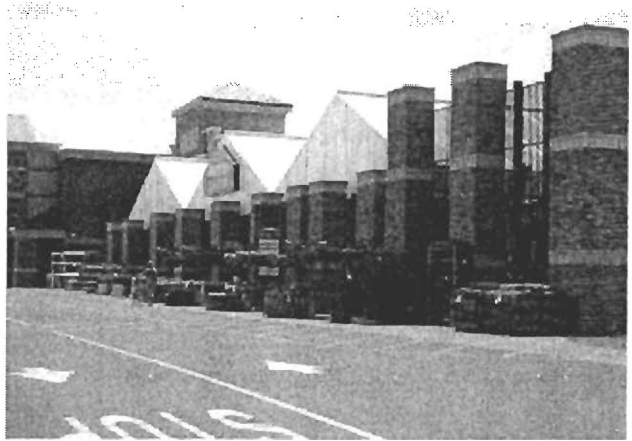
C.1: Outdoor sales area which compliments the adjacent building, utilizing similar materials and articulation.
